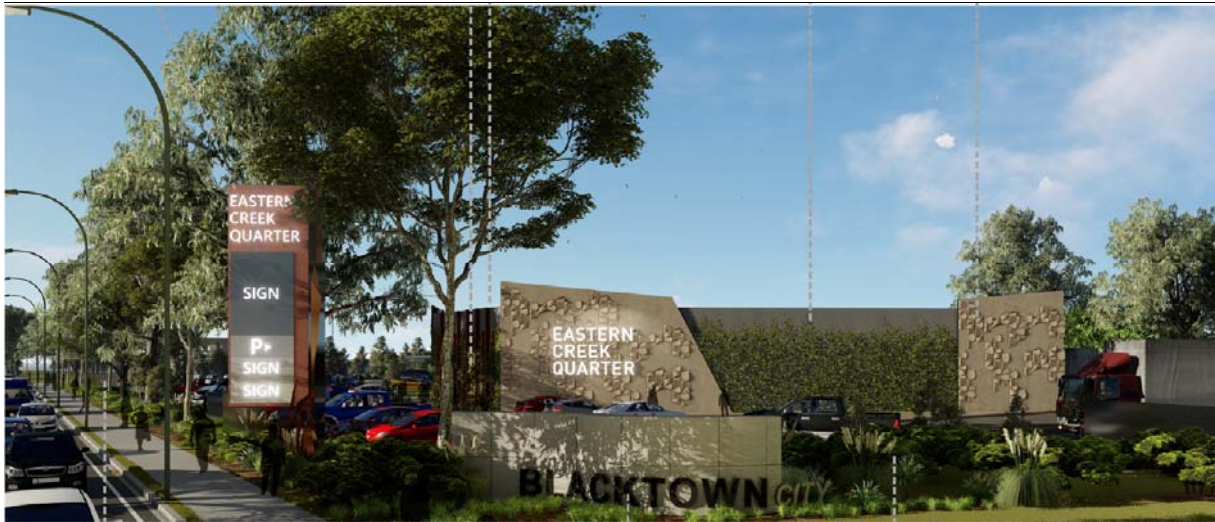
| Proposed Building 1 façade, viewed from Great Western Highway
